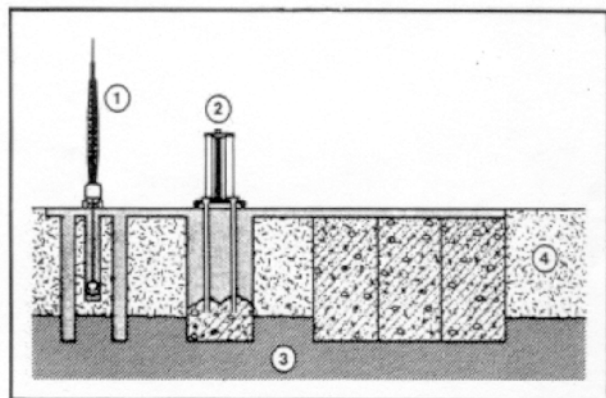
Twin-phase method trench excavated under bentonite slurry and filled with concrete by tremie (ICOLD, 1985)
